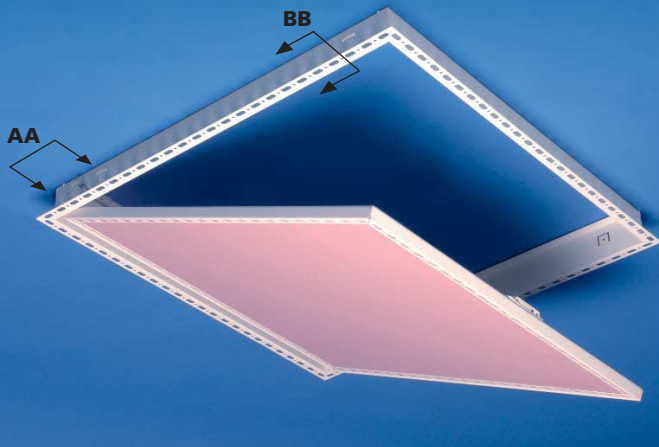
SECTION AA BEADED DOOR WITH BEADED FRAME FIRE RATED
